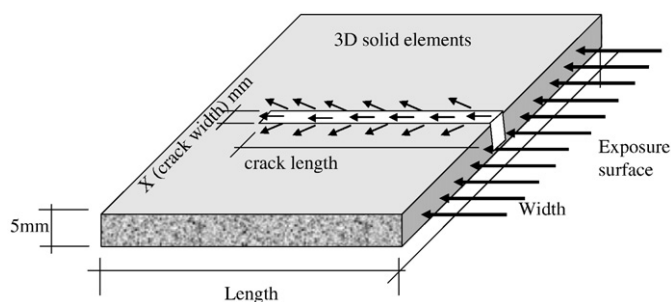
Modeling of chloride penetration profile in cracked concrete by void elements.
